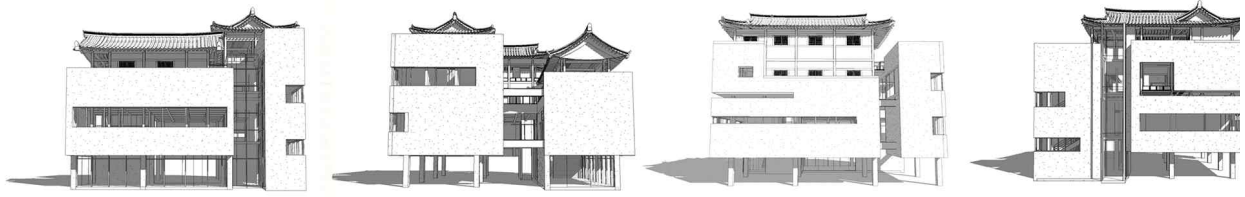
Elevations of the urban mid-rise Han-ok house(south, west, north, and east elevation from the left)
